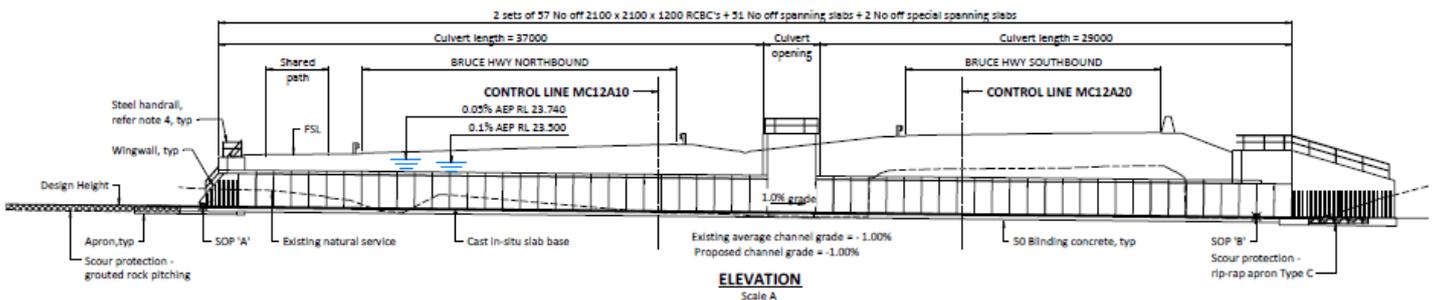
Mackey Ck Culvert Cross Section detailing 0.1%AEP (1:1000 year) and 0.05%AEP (1:2000 years)
